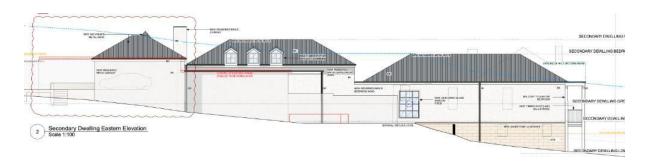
Proposed north-east (side) elevation – Dwelling 2
